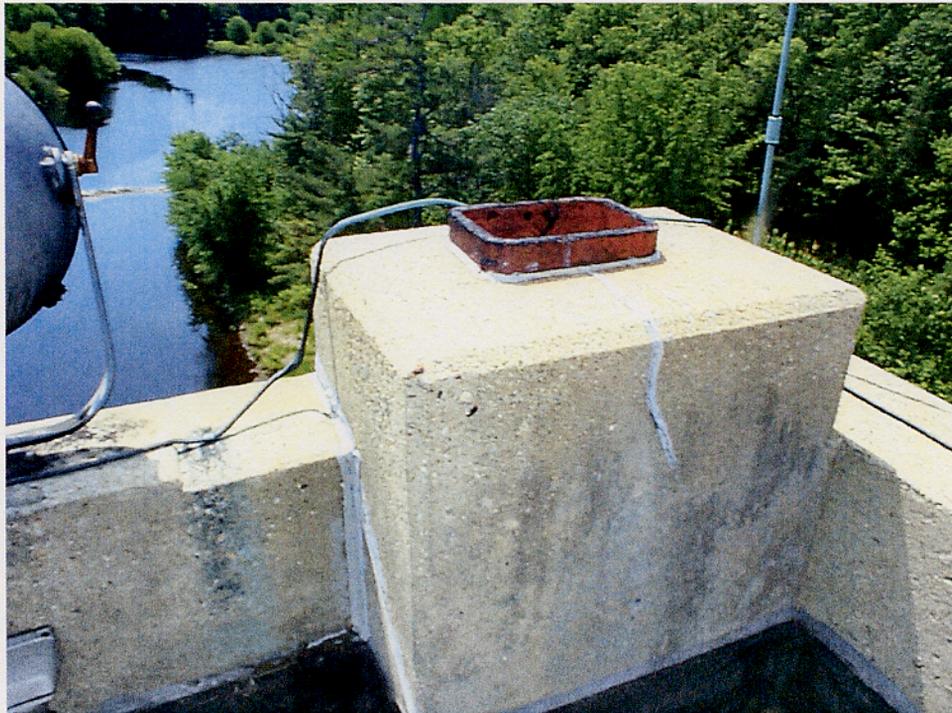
Southwest chimney. Note sealed cracks in chimney and crack in flue liner, typical at northeast chimney.
